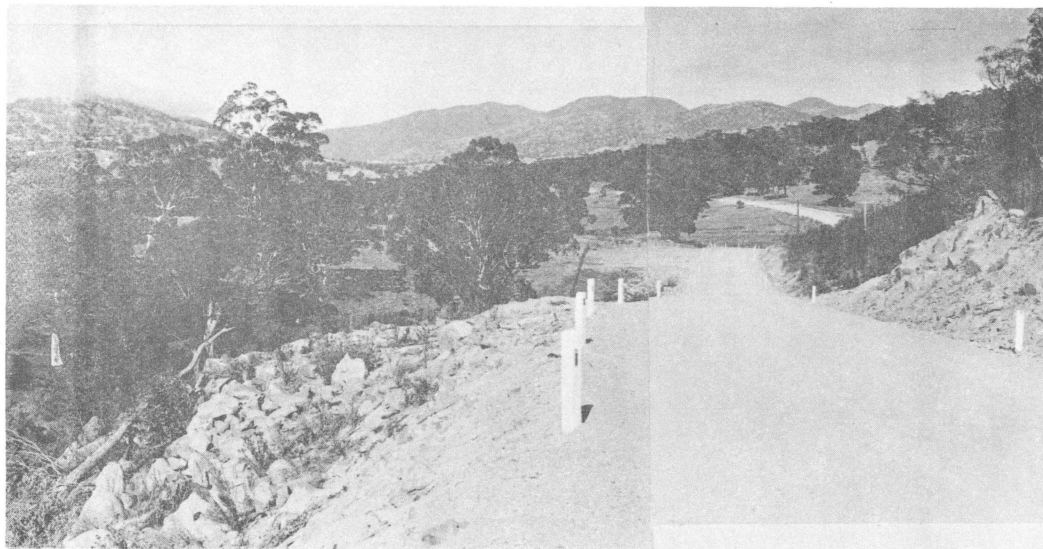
From 18020/84670 looking South. Naas Road and reservoir area; a spillway running from the saddle down the small valley at the left is proposed.
